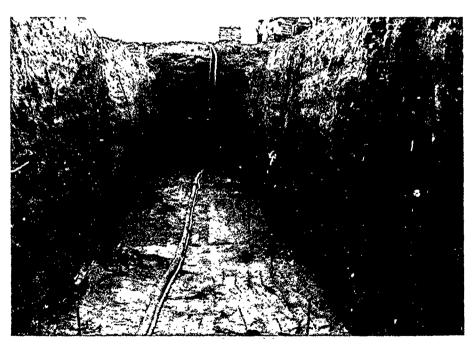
Hydropower conduit, looking downstream, Sta. 30+10.
